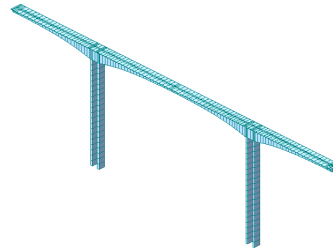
Schematic diagram of the finite element model of the rigid-frame bridge.
